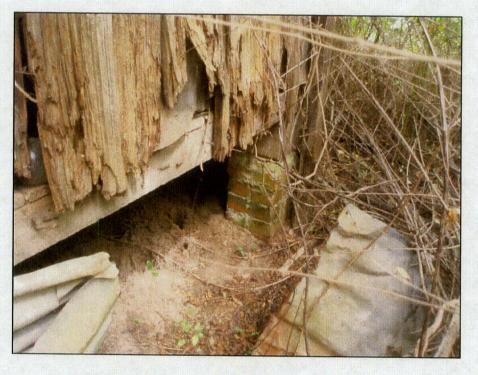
Storage building or barn (Structure B) located just south of store at site 41RK611, facing south.
